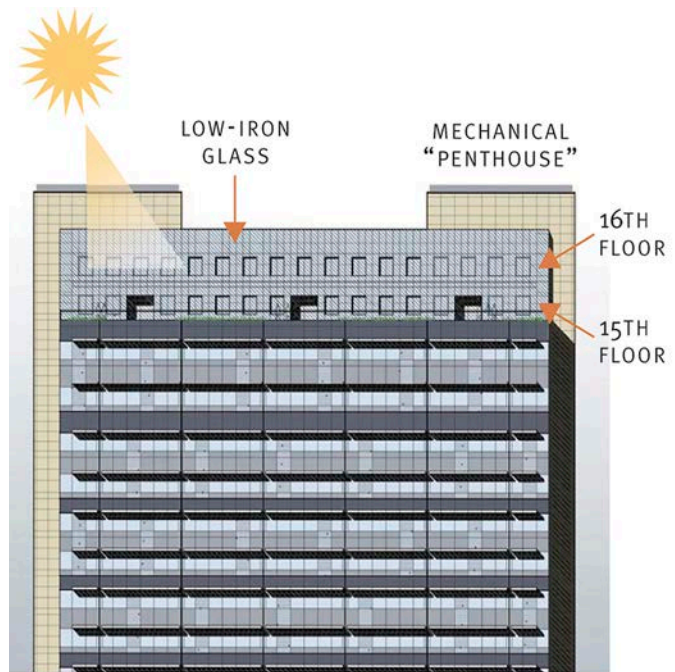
Detail of south facade. Source: GBD Architects Inc./Sally Schoolmaster
